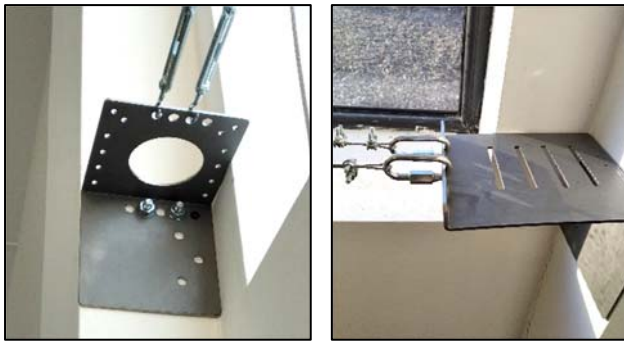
Steel wire with tensioners and the consoles on the wall
